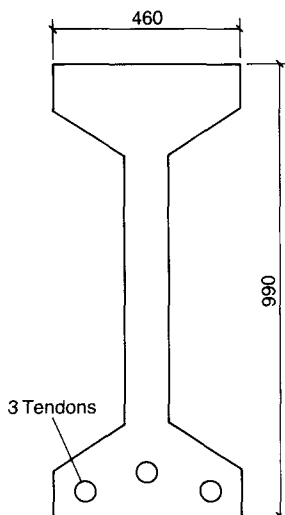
Cross-section of a beam of a post-tensioned precast concrete roof which collapsed due to corrosion of the tendons
